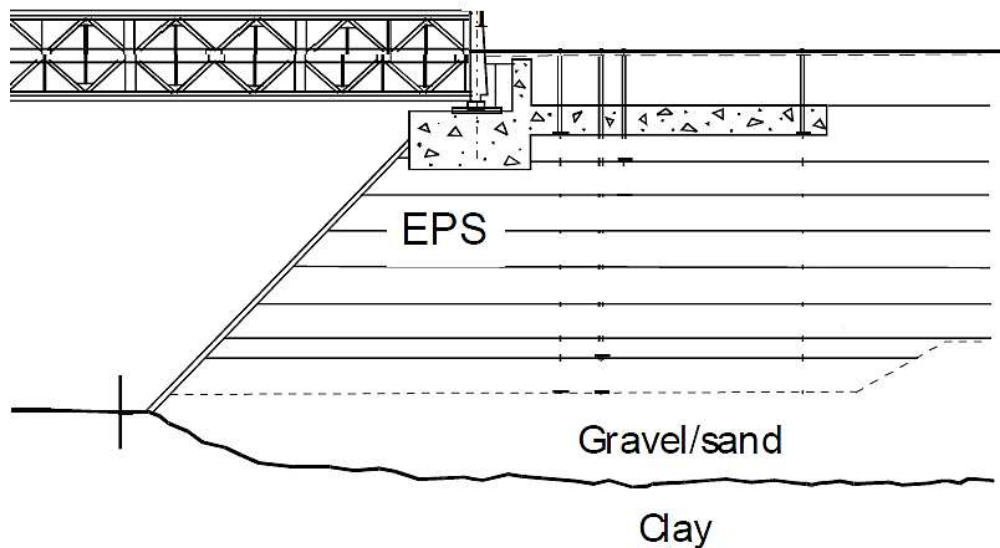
Cross section of the Lokkeberg bridge embankment
